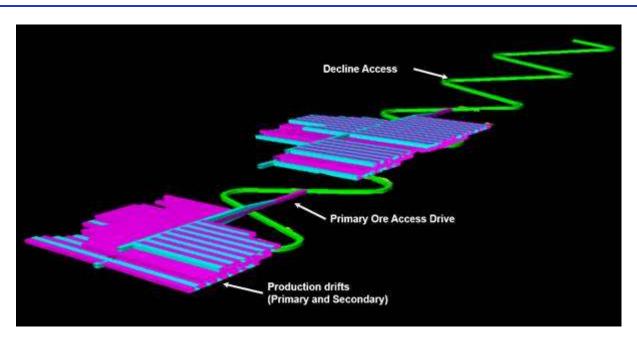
TYPICAL DRIFT AND FILL LAYOUT
